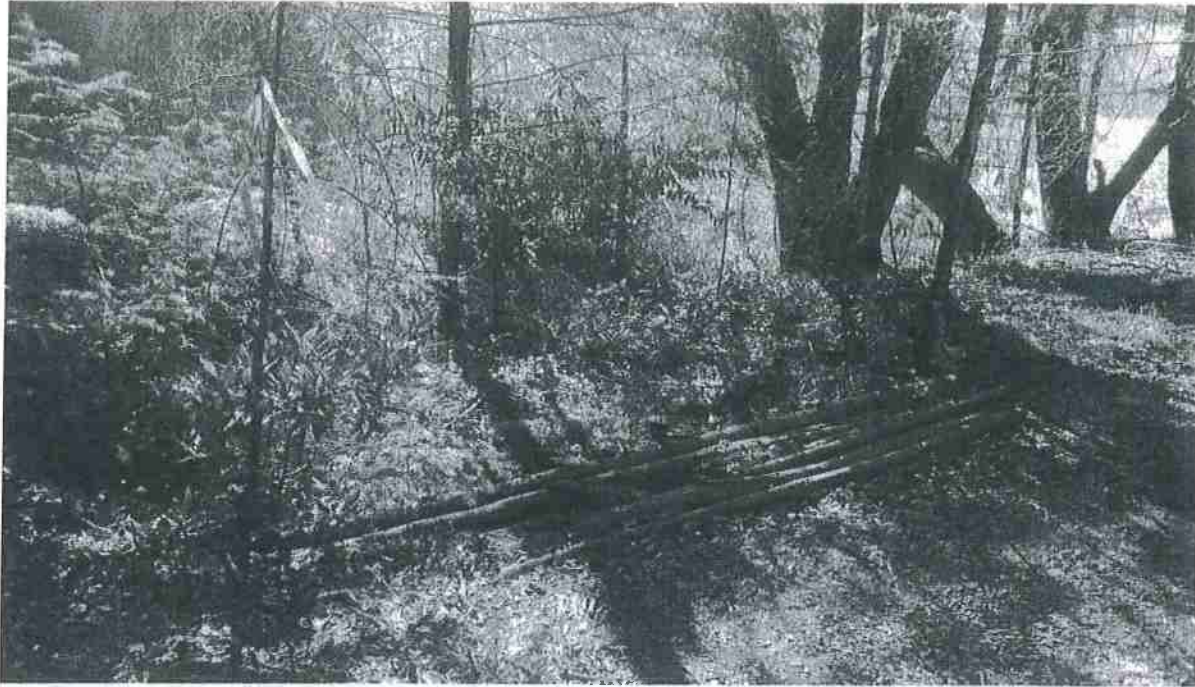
Looking at Crossing #3 from the western approach on a Class III watercourse.
